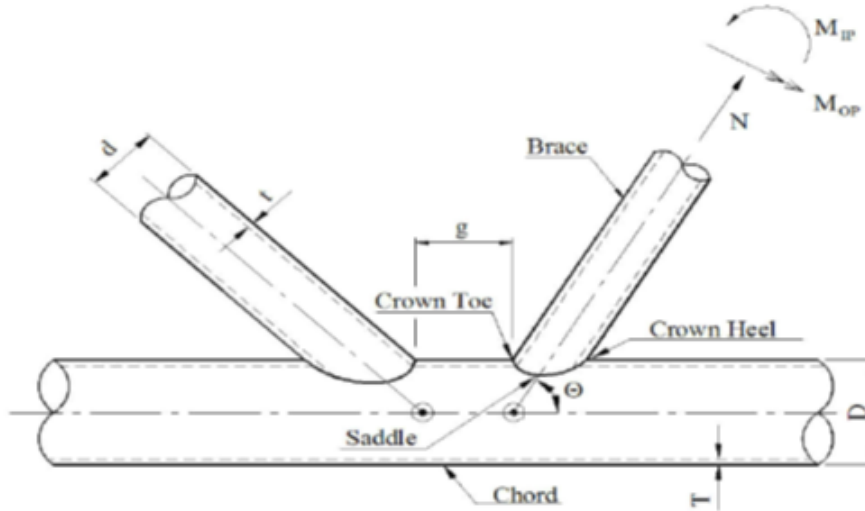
Geometrical definition & Loading on tubular members. [5]
